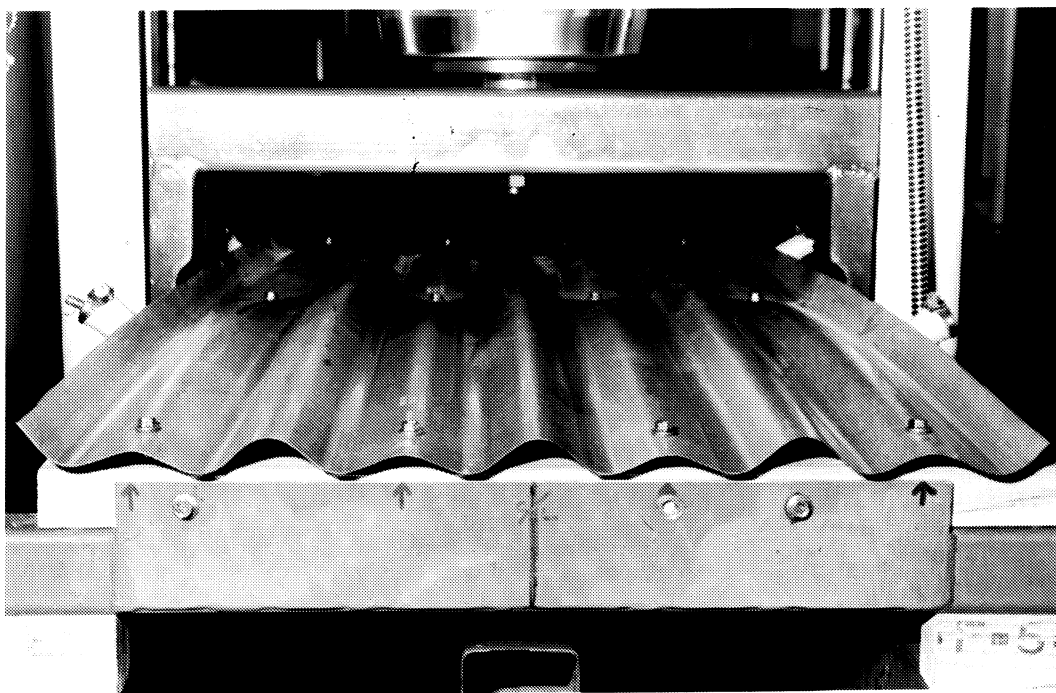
Cross-sectional Distortion of Corrugated Roofing Fastened at Alternate Crests
